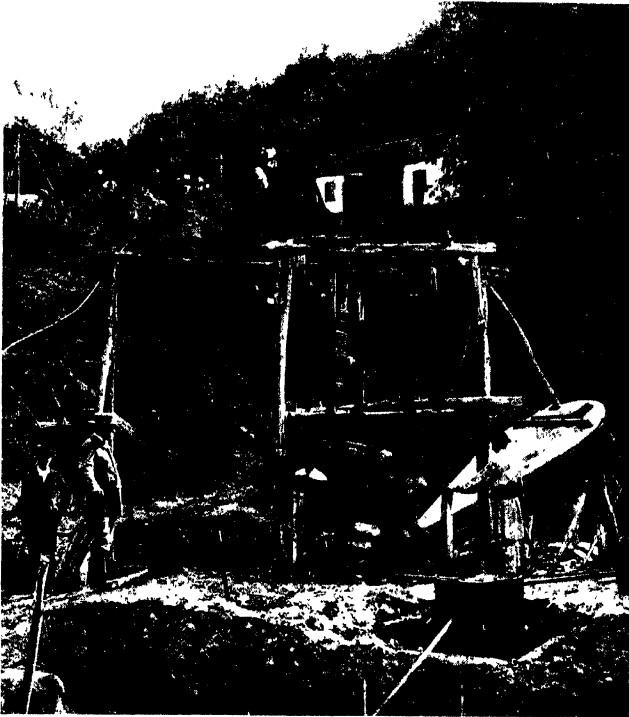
SINKING OIL SHAFTS BY HAND.
